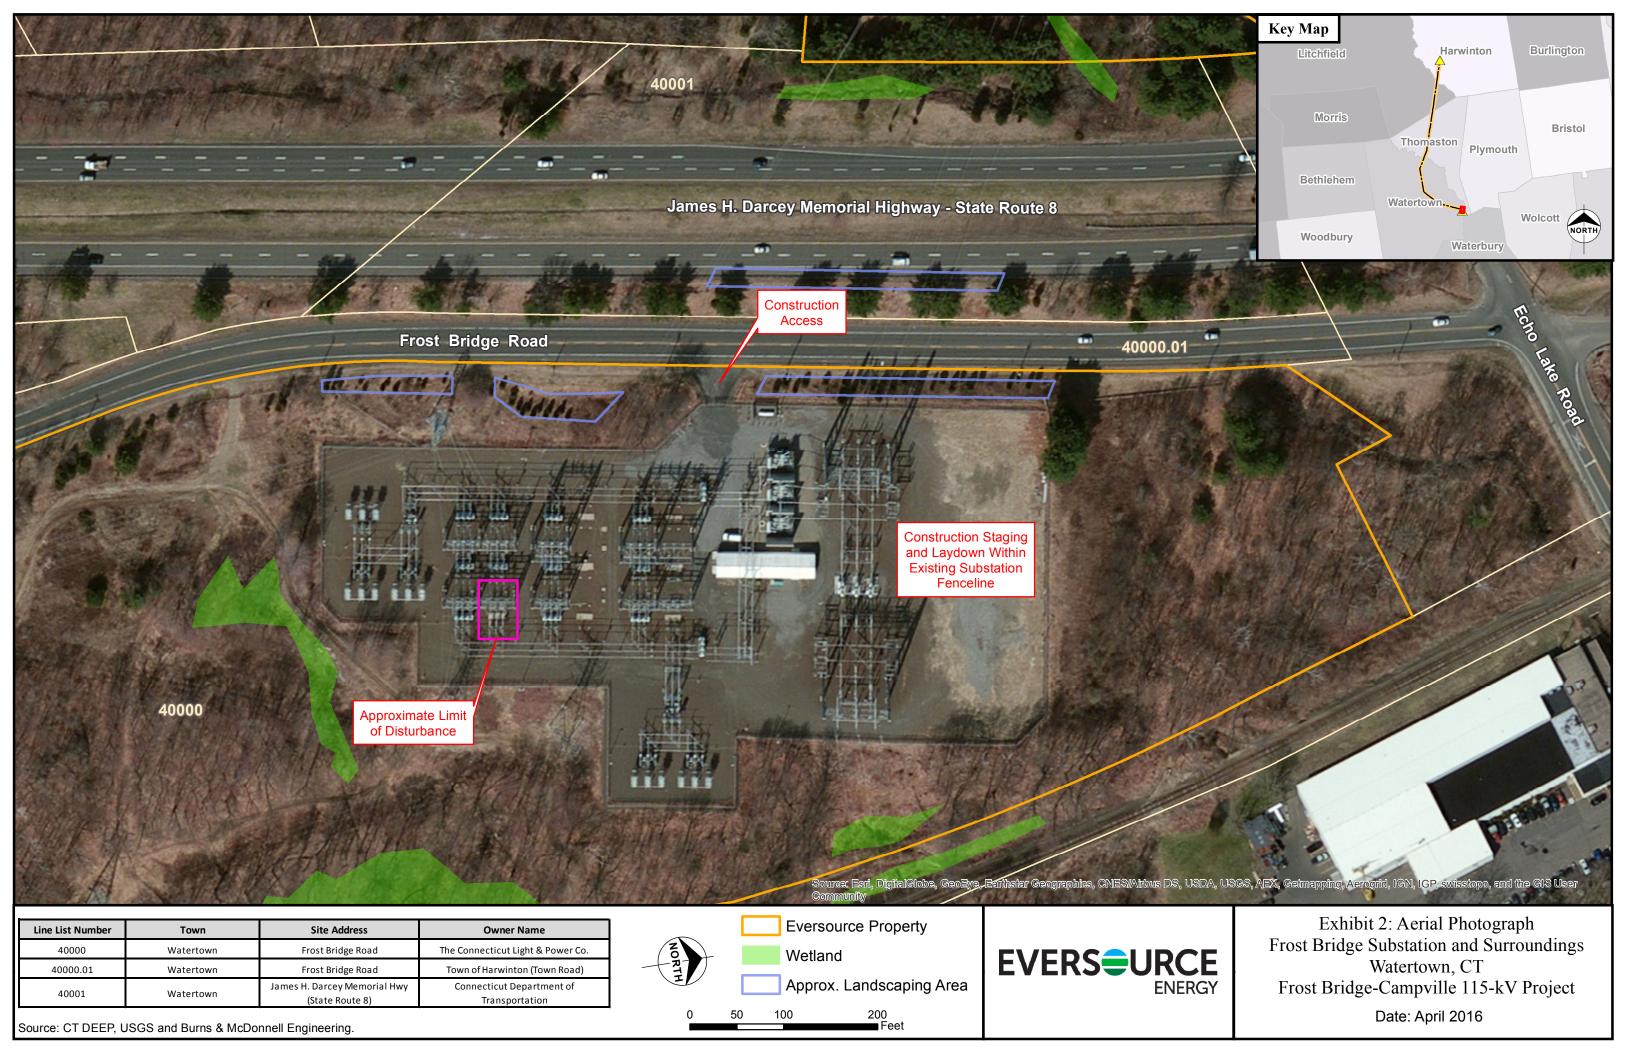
Aerial Photograph Frost Bridge Substation and Surroundings
